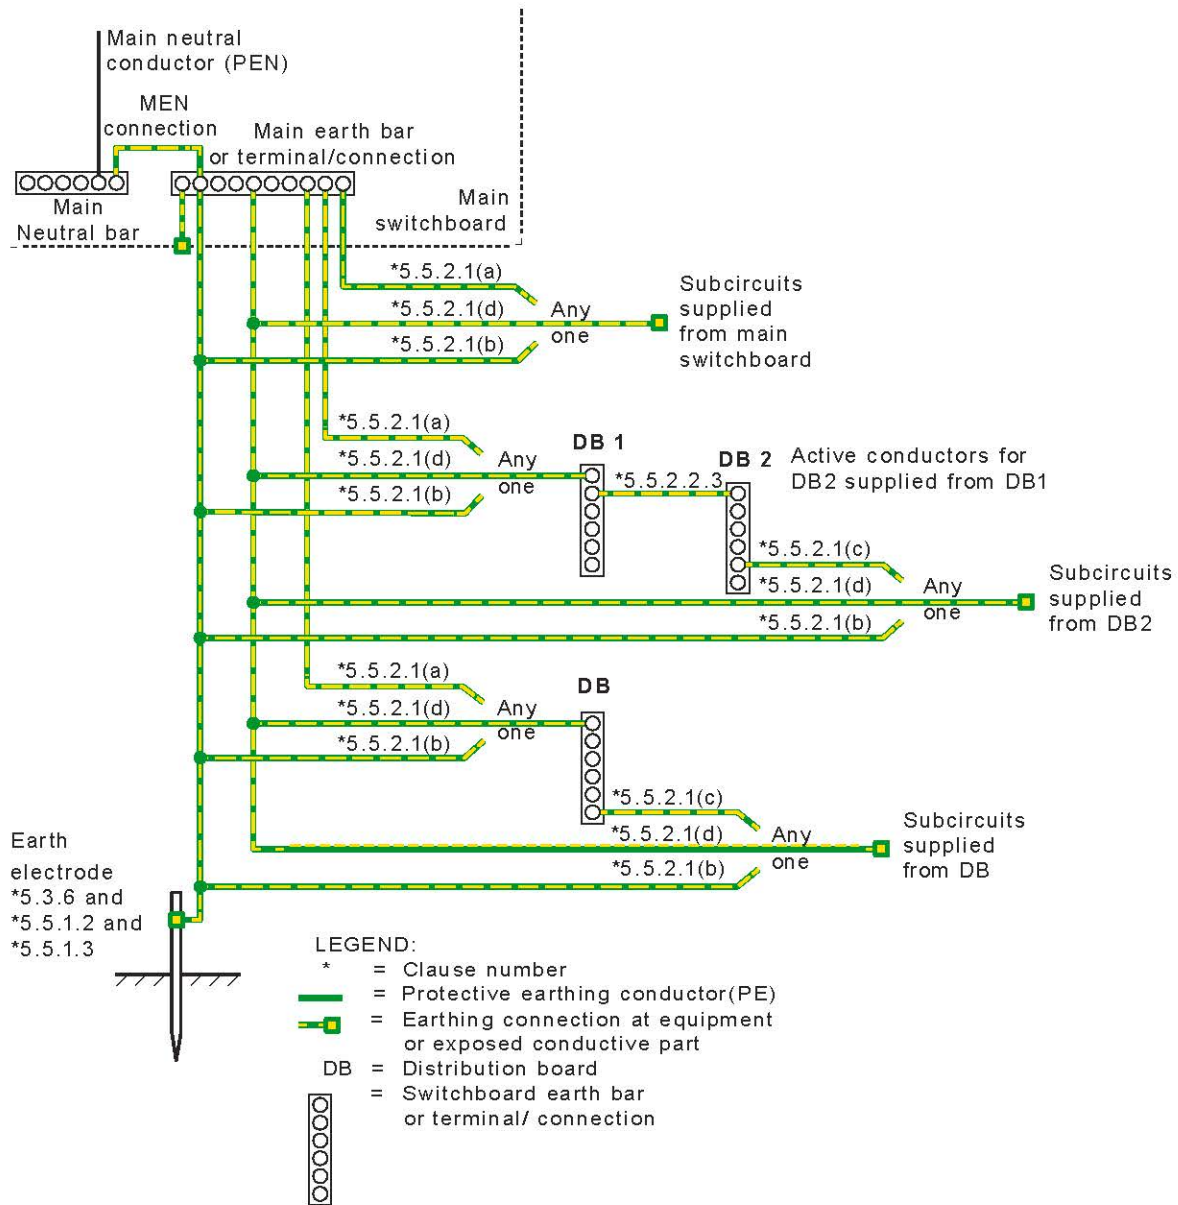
EXAMPLES OF EARTHING ARRANGEMENTS
